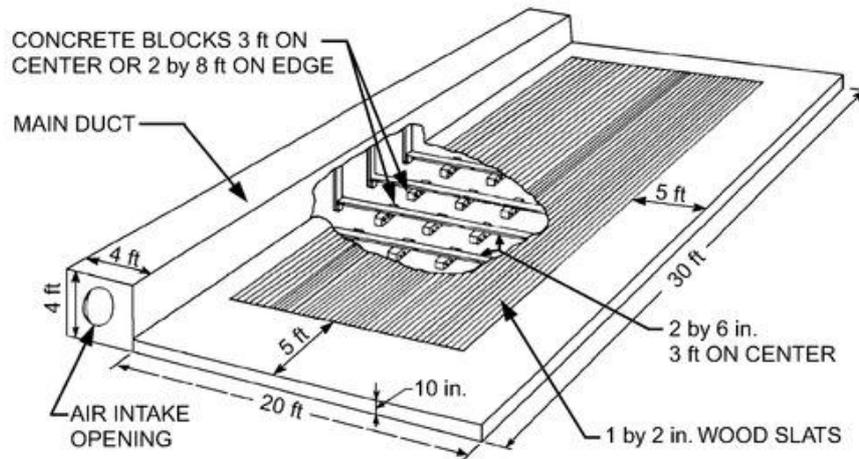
Central Duct Hay-Drying System with Lateral Slatted Floor for Wide Mows
